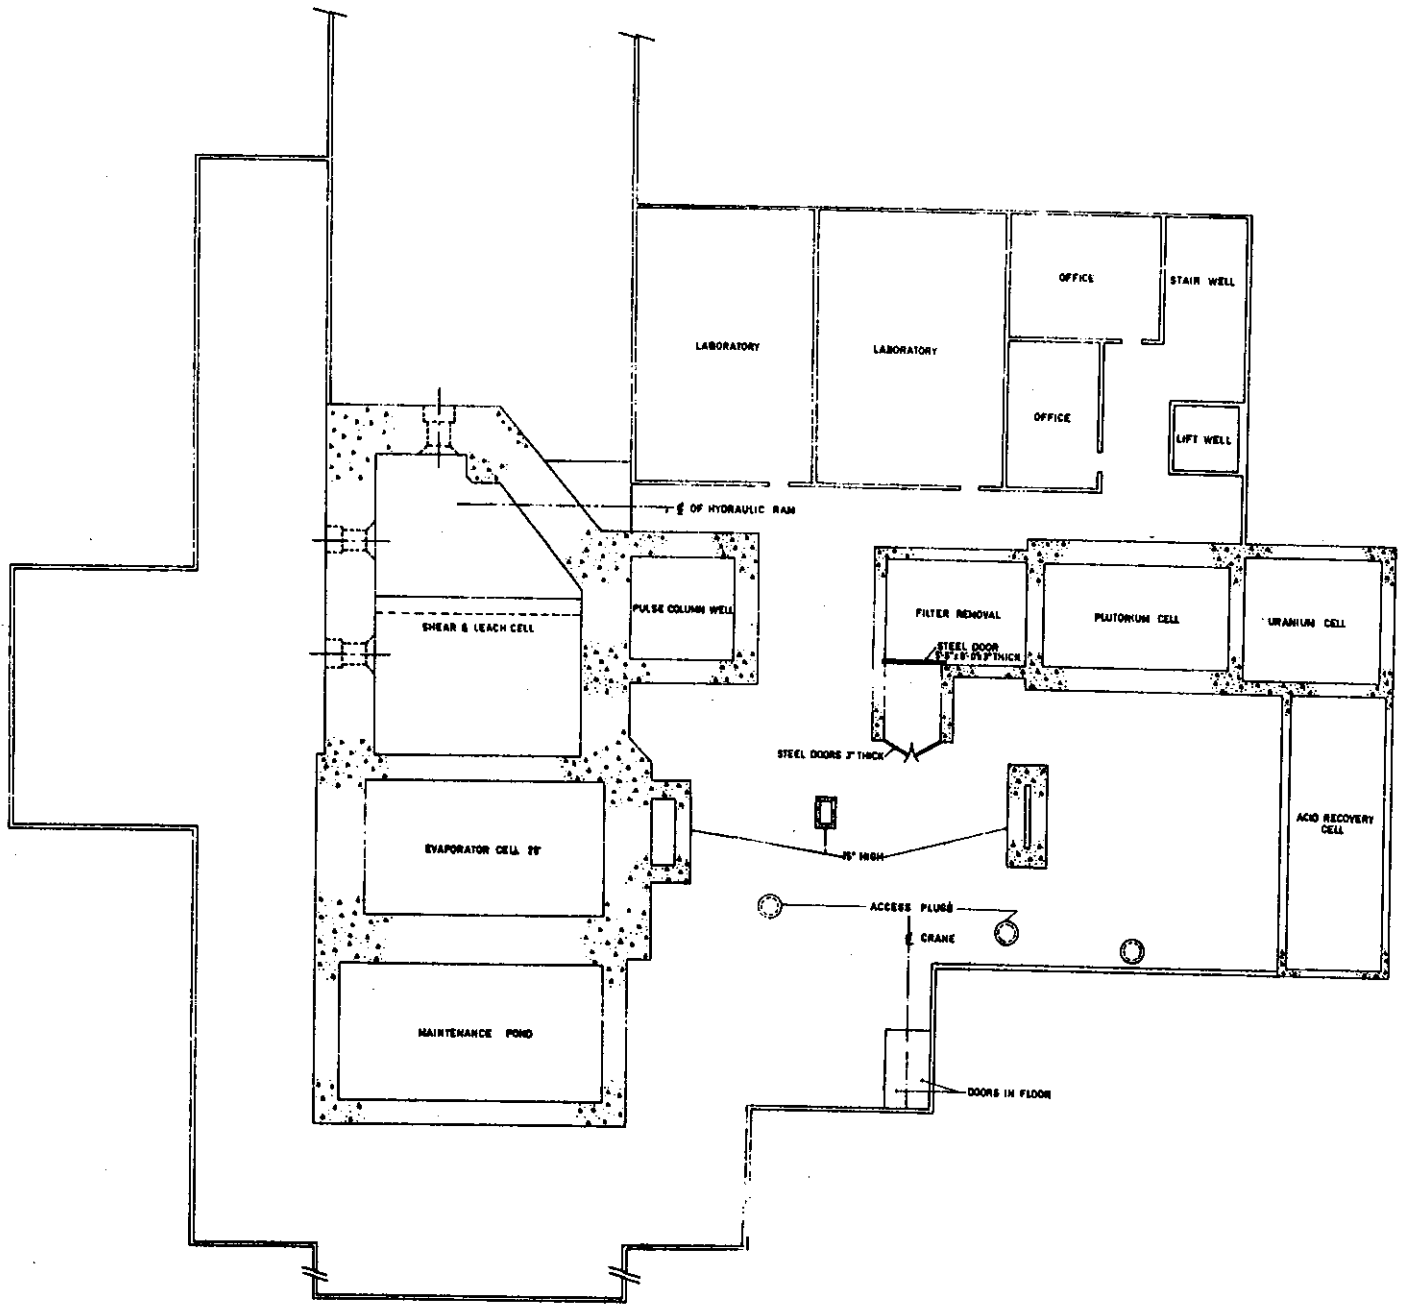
BUILDING DESIGN - PLAN 20 ft TO 36 ft
